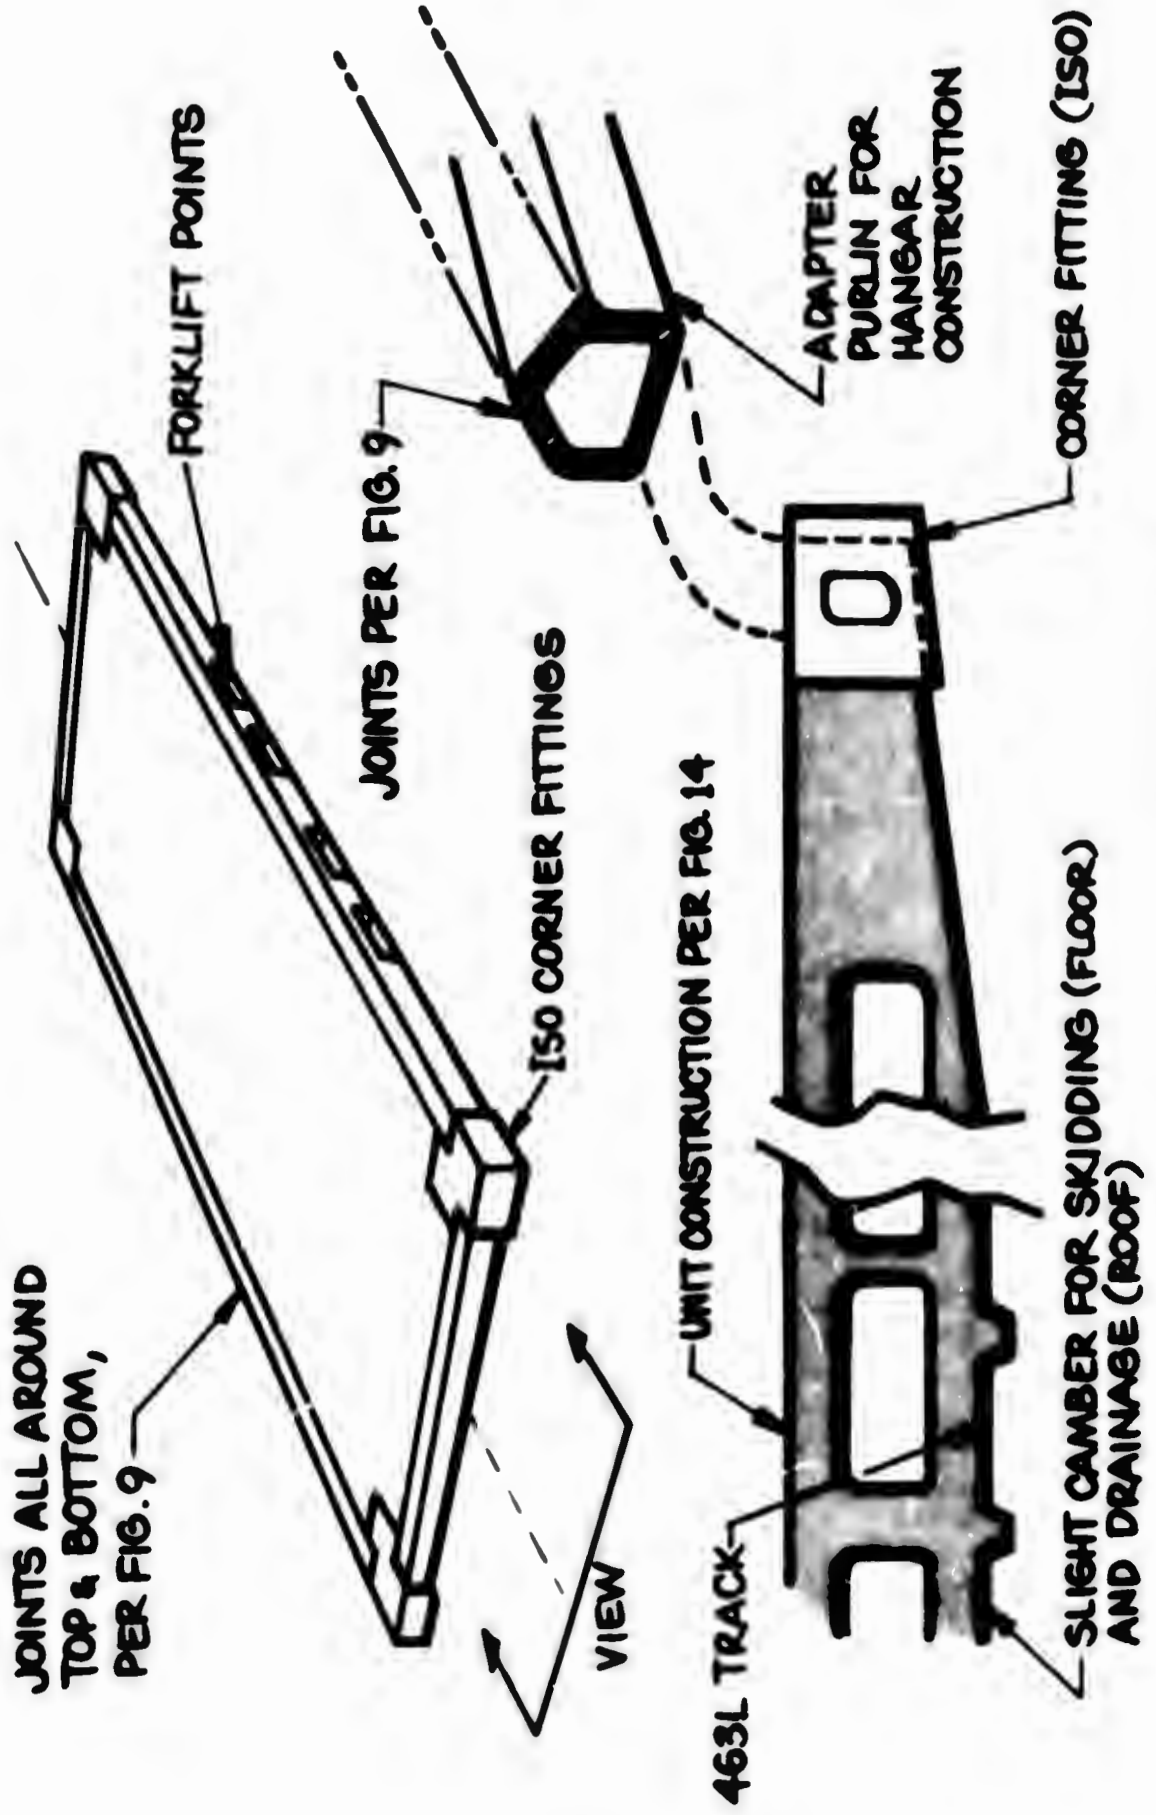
Shelter Family-Floor/Roof Panel Concepts
